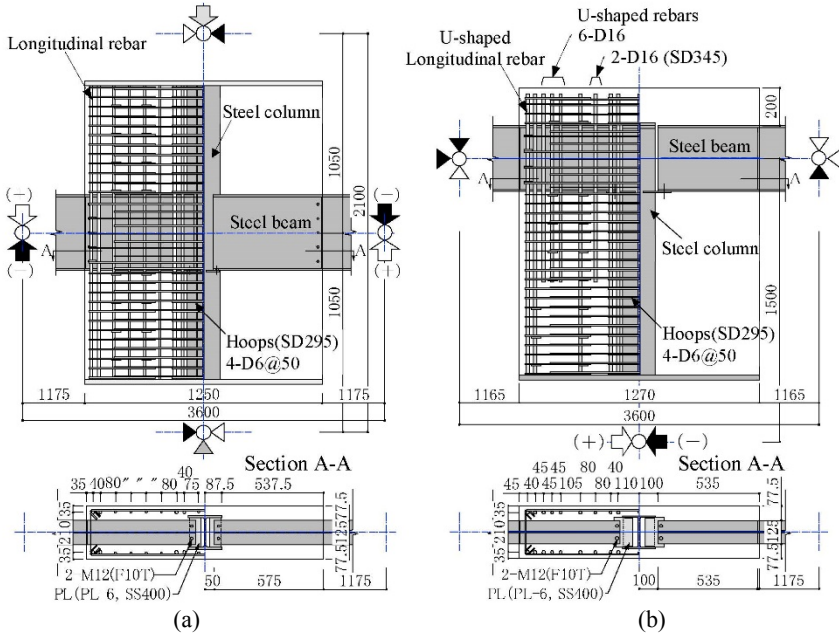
Detail of specimens (dimensions in mm). (a) Specimen No. 1; (b) Specimen No. 6.
